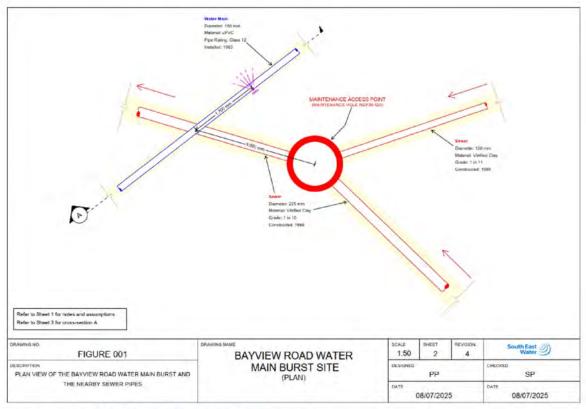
Plan view of Bayview Road water main burst & nearby sewer pipes
